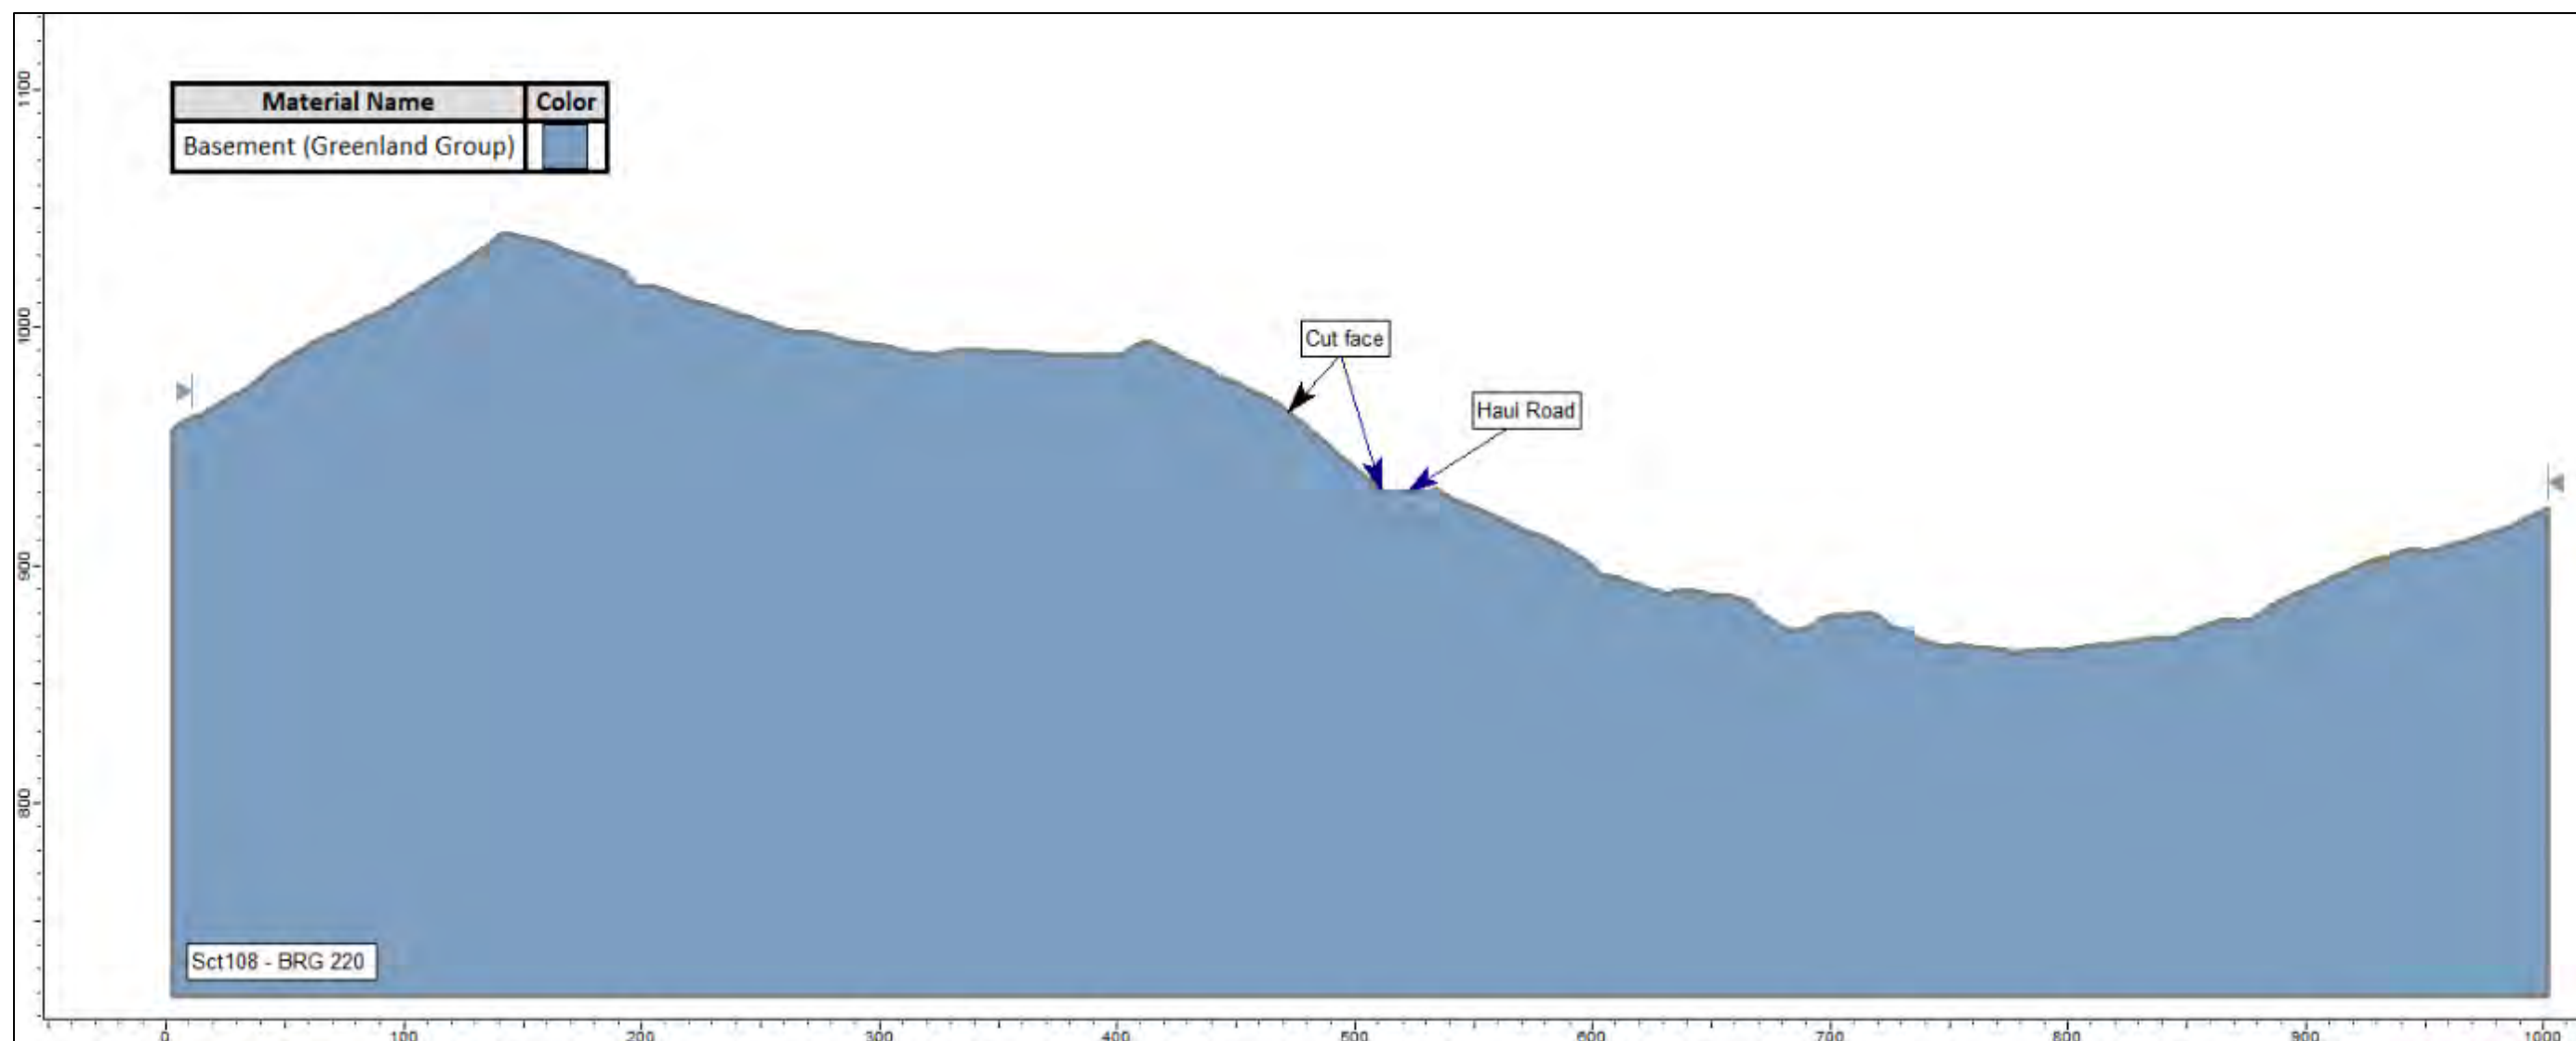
Section 108 – Haul Road Cut – Overview.
